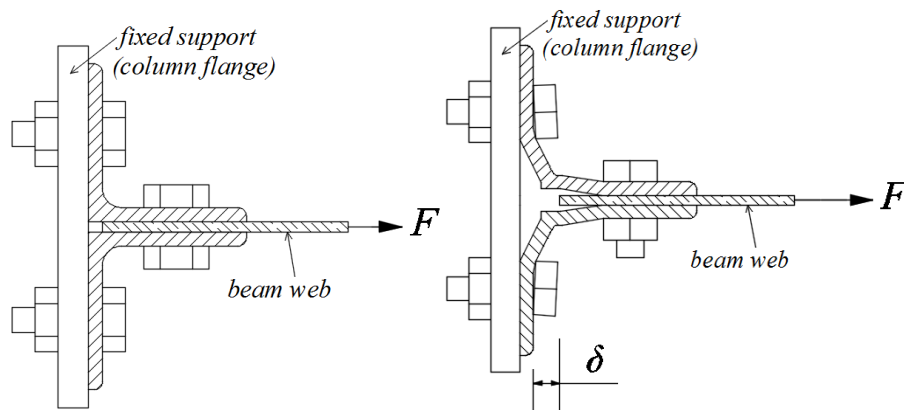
The cut view and potential deformed shape of the bolted double-angle component
